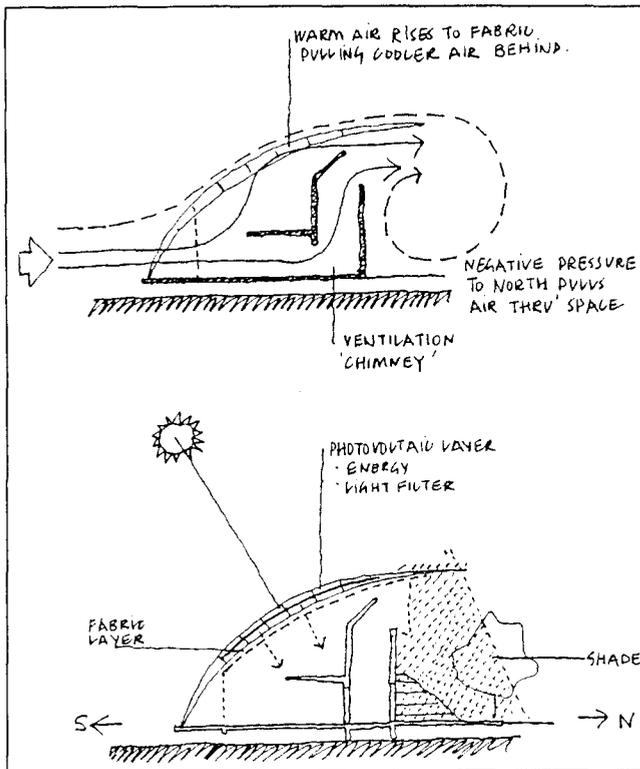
Ventilation, structure, and enclosure. Pavilion, Washington, DC. Scott + Donnelly.
